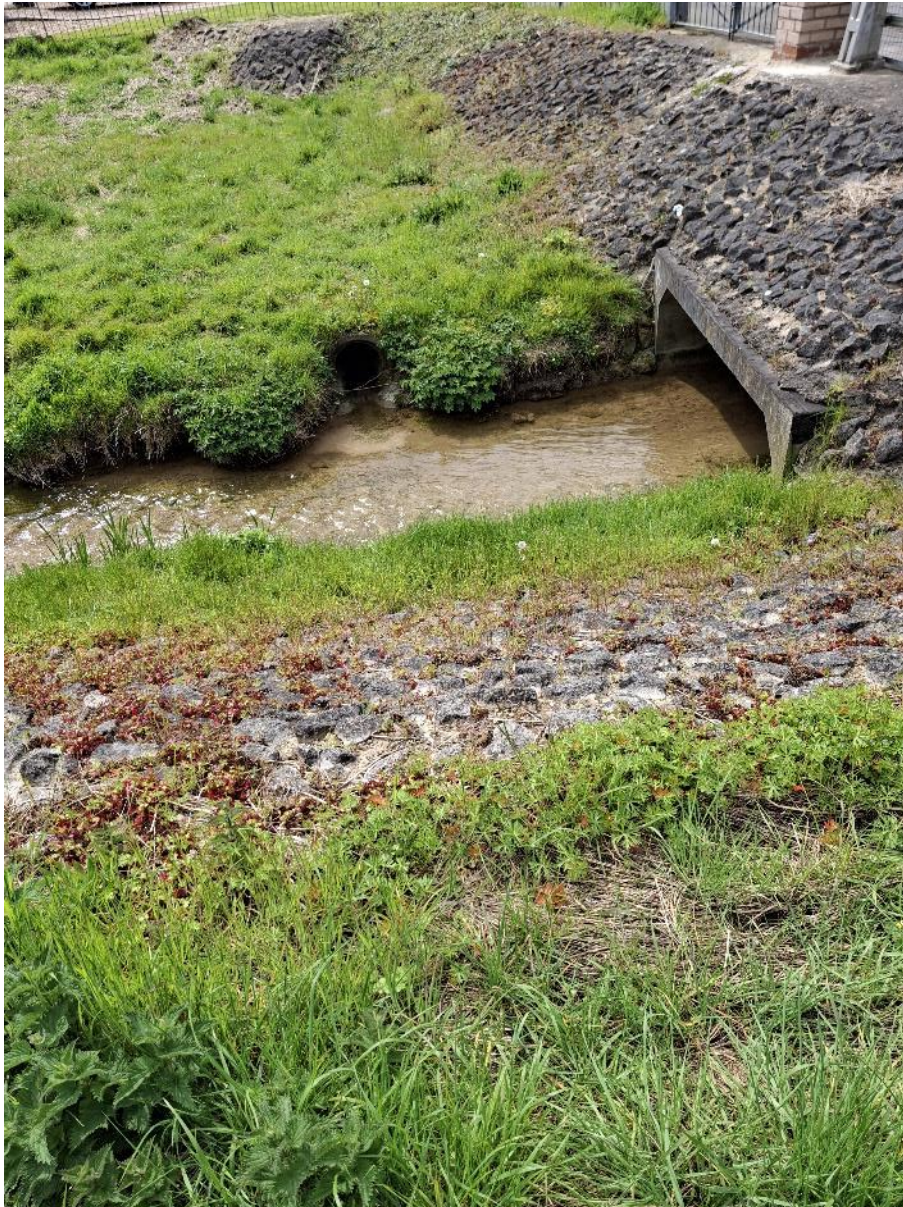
The north-western section of Maltby Way; facing north)
